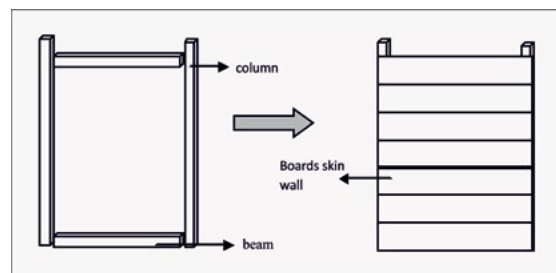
Boards attached to columns act as stiffeners by binding the column and beams
